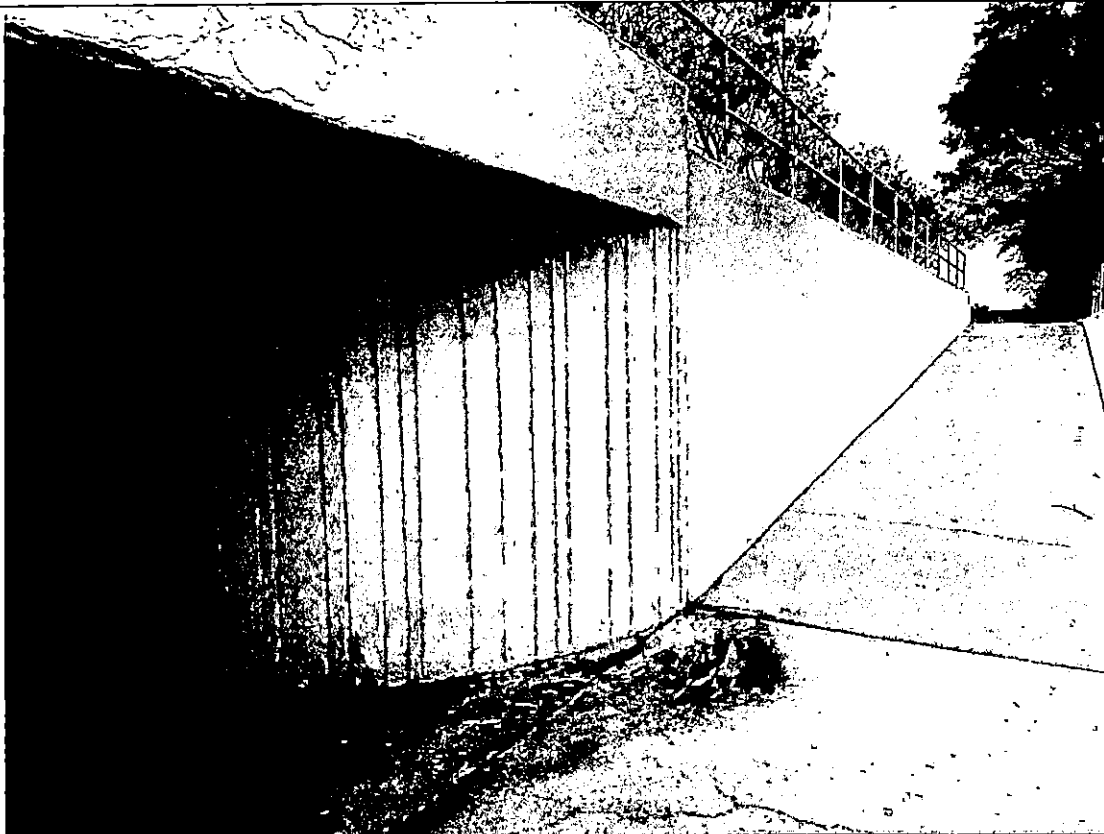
DESCRIPTION	SOUTHWEST WING WALL
